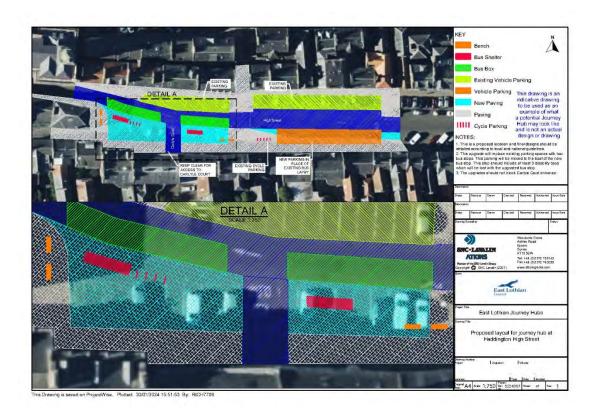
Indicative drawing of Haddington High Street Hub
